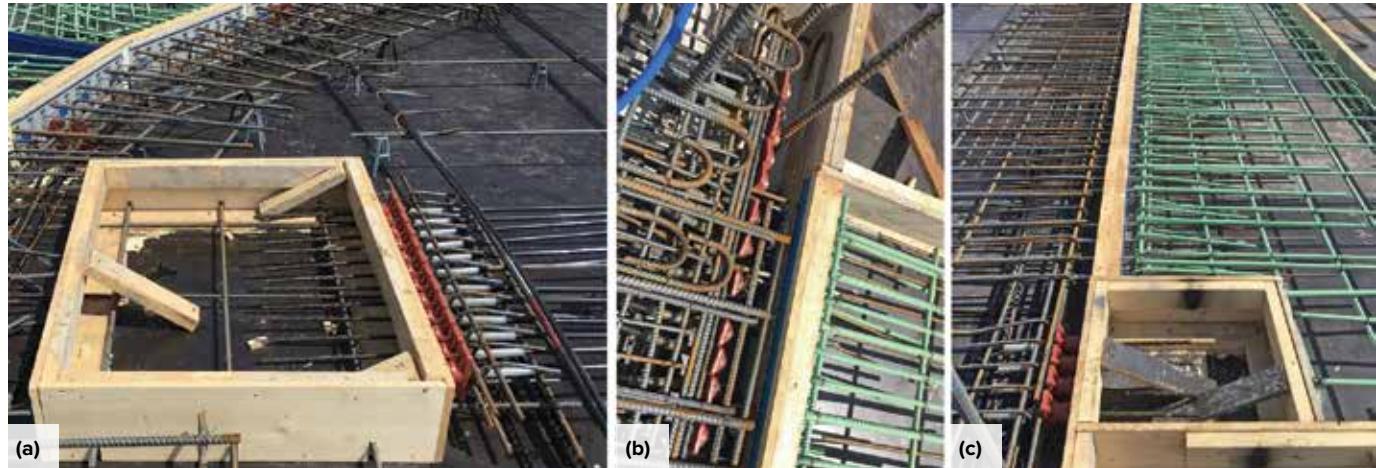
Structural thermal breaks can be installed in post-tensioned slabs: (a) a blockout within the slab; (b) a thermal break at dead ends of tendons; and (c) a blockout within a balcony. In the latter case, the opening can be filled using rigid insulation and concrete
